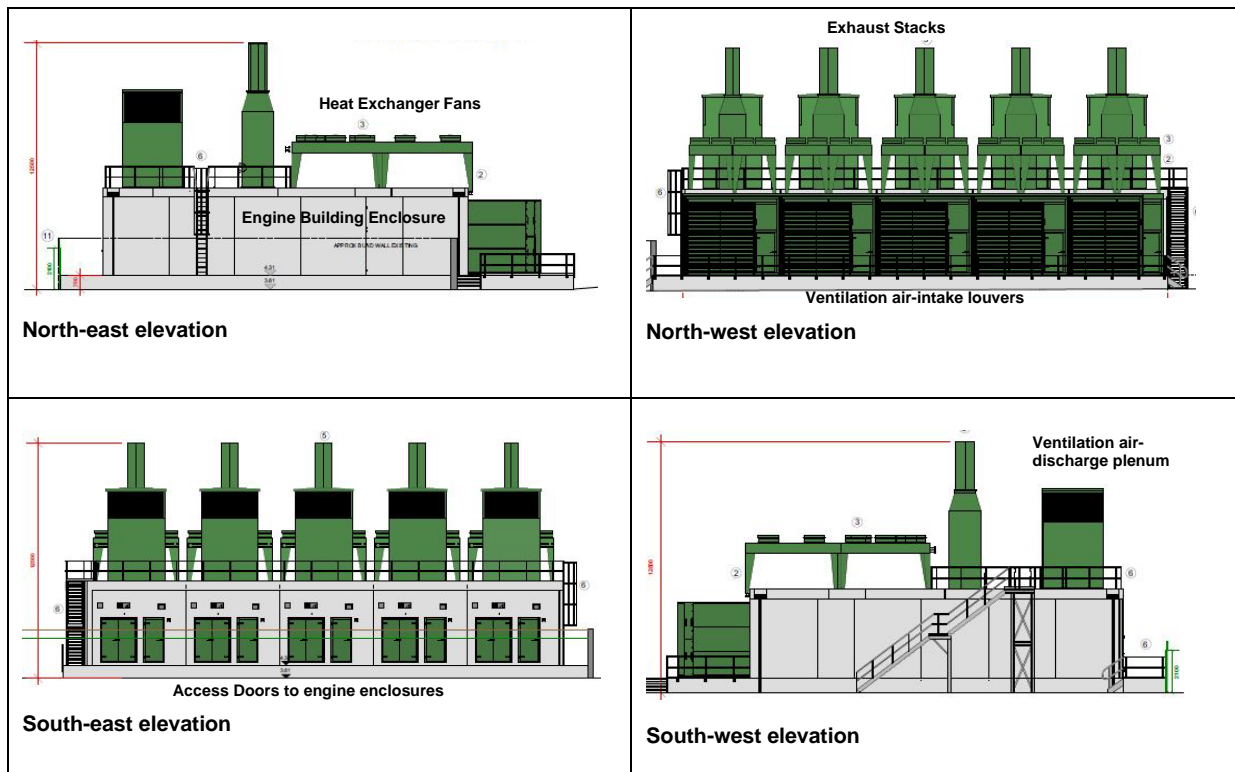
Detail of the Grimsby B site gas-engines, showing elevations and position of external plant items.
